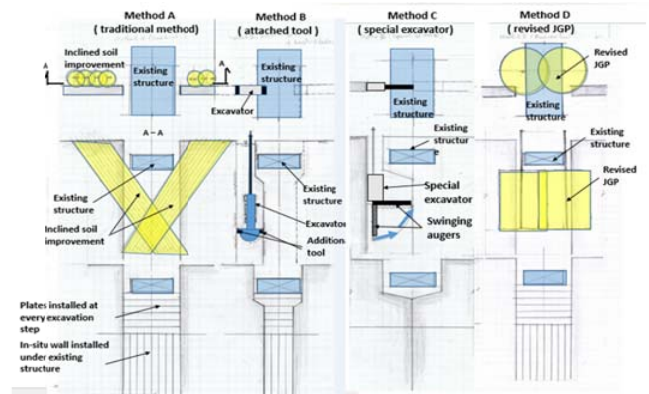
Diaphragm Wall Construction Method under Existing Structure
